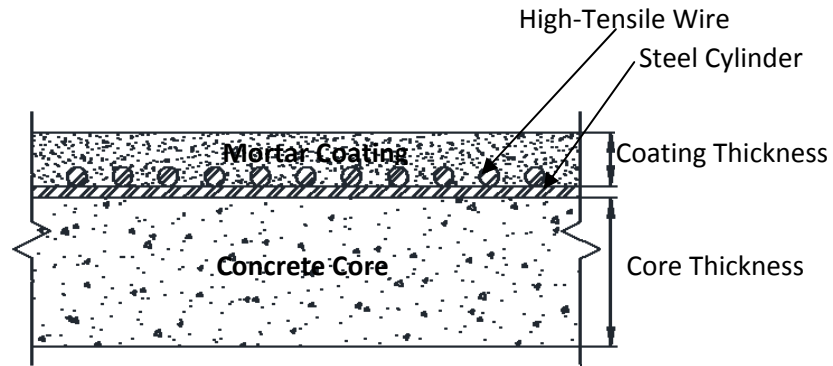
(a) Longitudinal section of wall of PCCP-LCP
